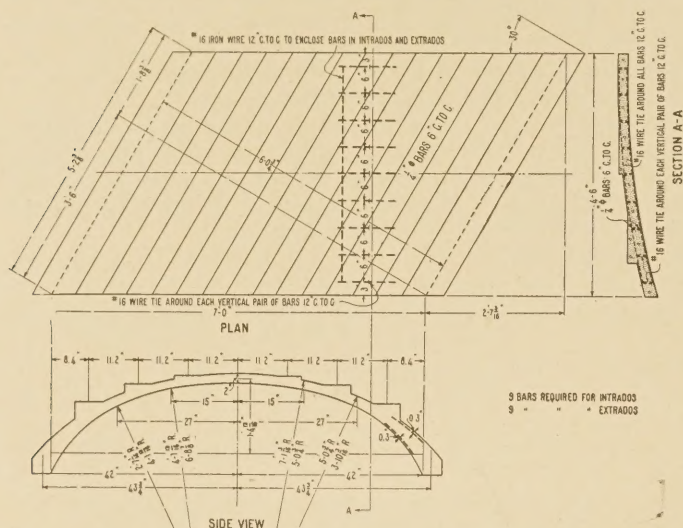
Detailed sketch of 30° skew arch. The structural details and dimensions for the 15° , 45° , and 60° arches were the same with the exception of the span at right angles to the abutments and the oblique length of the abutments
